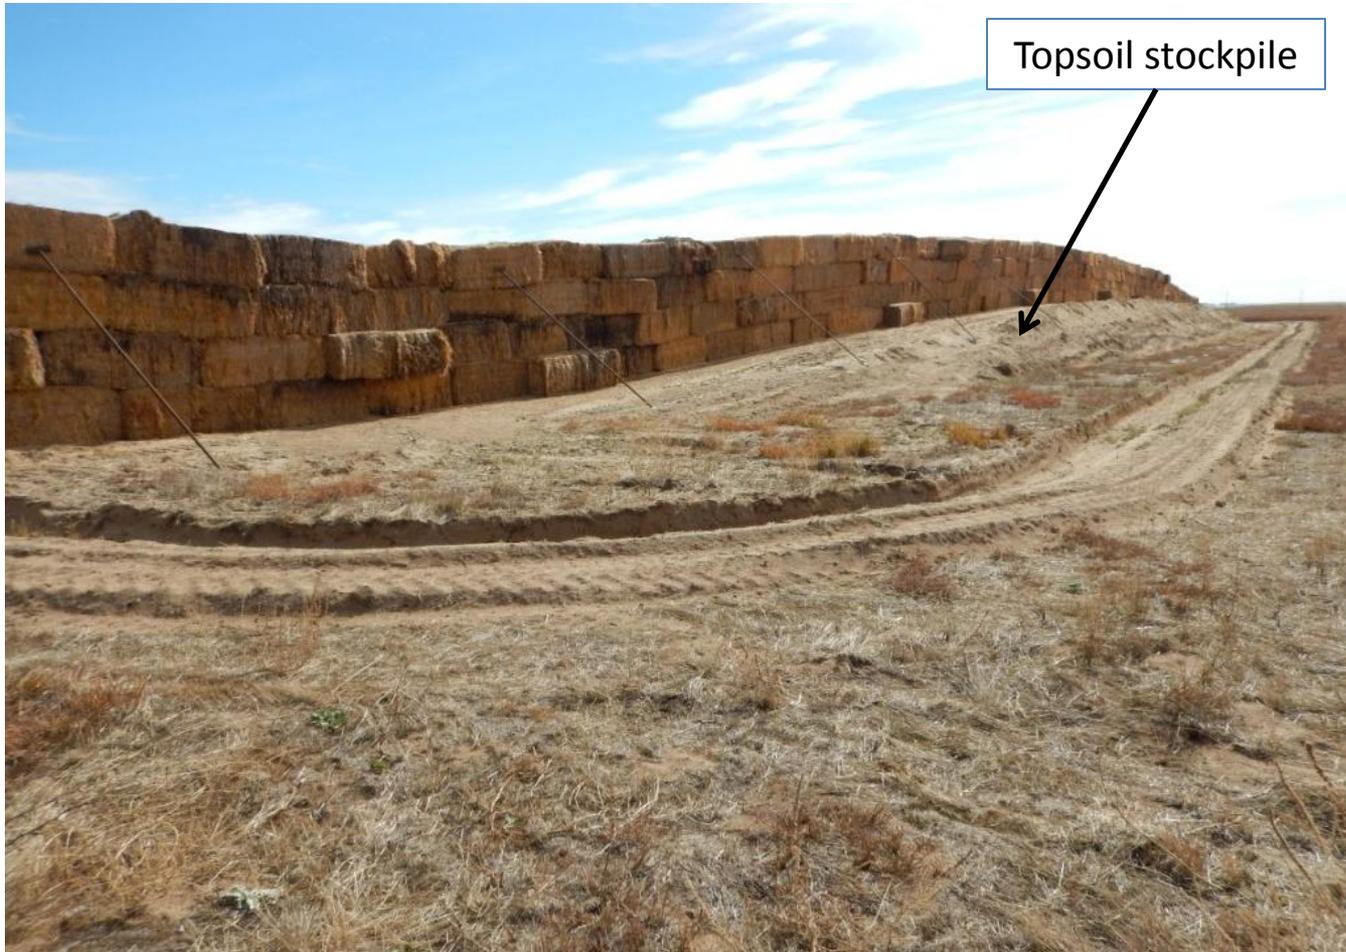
Photo taken from northeast location, facing West. When interim reclamation starts, this area shall be reclaimed and minimized where production or facilities are no longer necessary.
